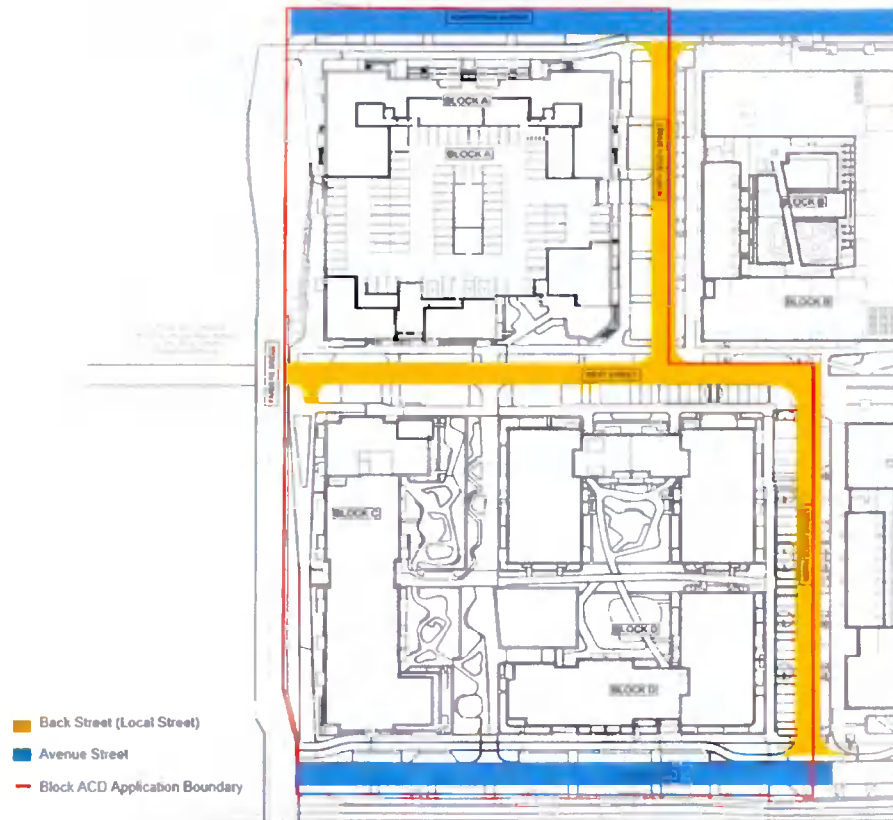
Extract from Roads Design Report, prepared by Atkins Consulting Engineers illustrating the roads hierarchy within the proposed development.
